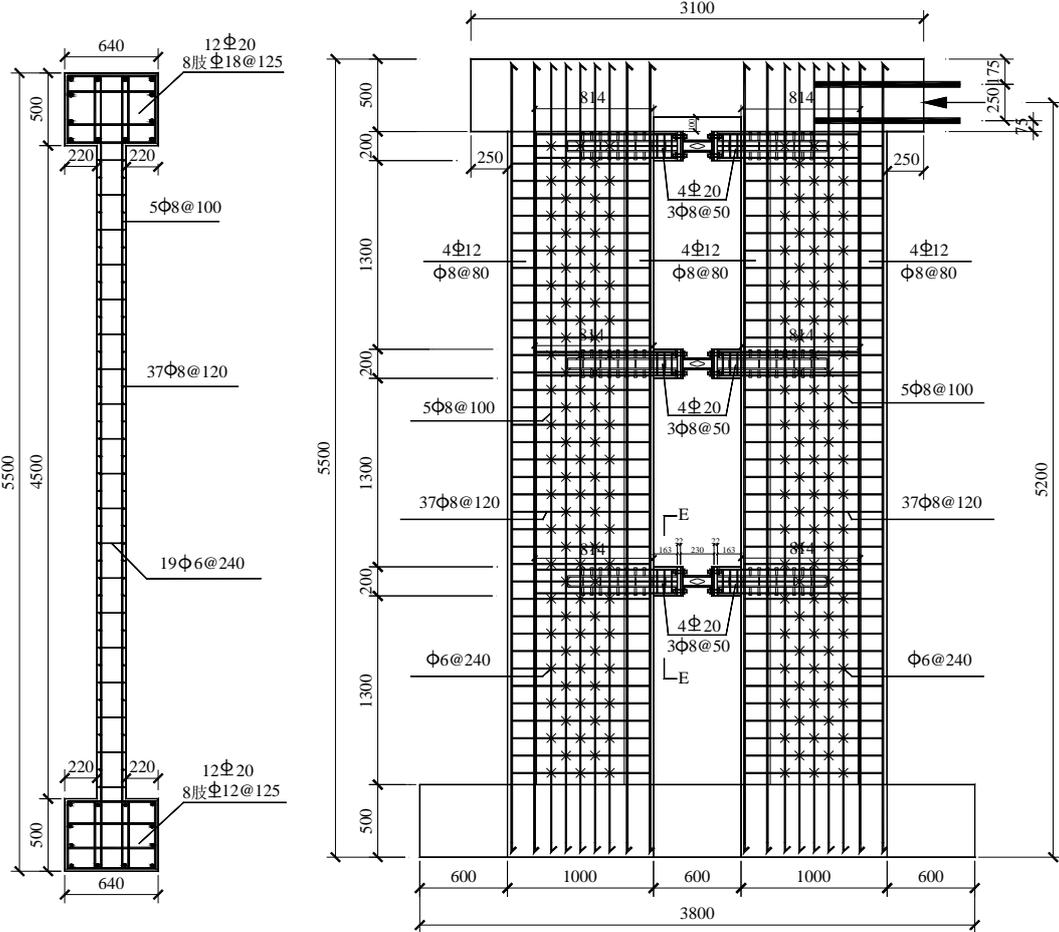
Reinforcement of new shear wall with replaceable coupling beams
